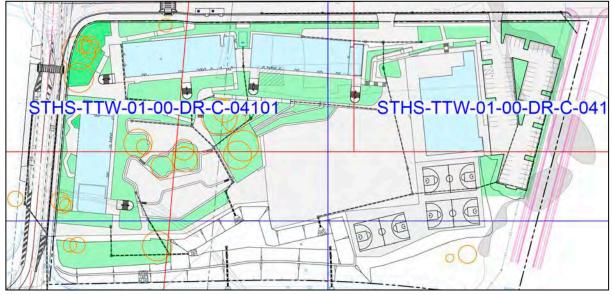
The site plan. (Source: Architectural Plan Set by Djrd Architects Issue 9 dated 20/01/2025)
